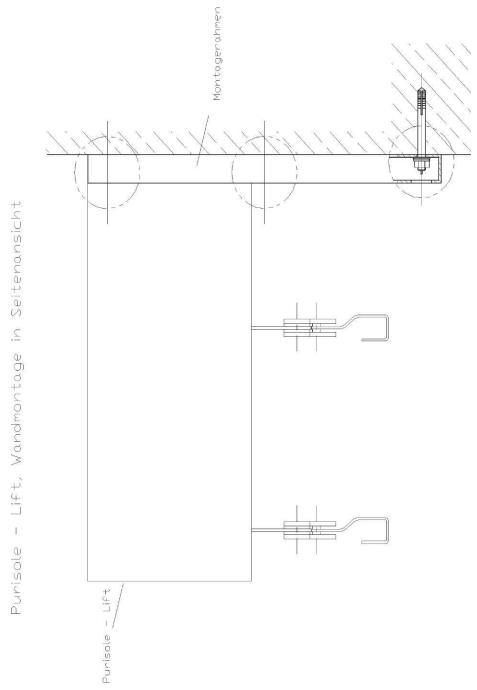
Purisole lift, side view of wall installation, 1:2 scale
